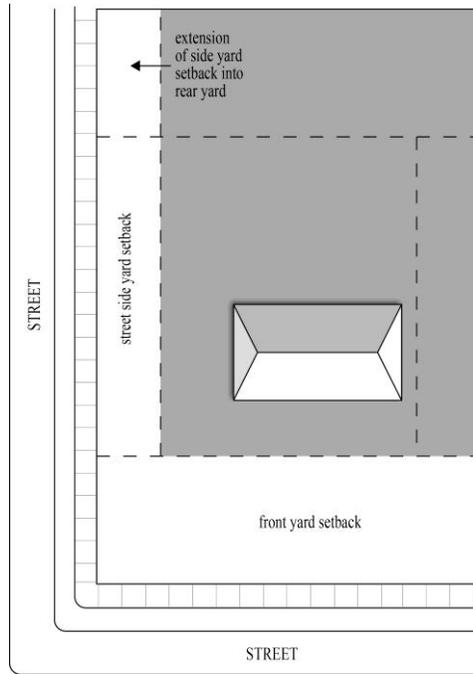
Residential Parking Locations: Corner or Reversed Corner Lot. Parking is allowed in shaded areas and on driveways in approved locations.
